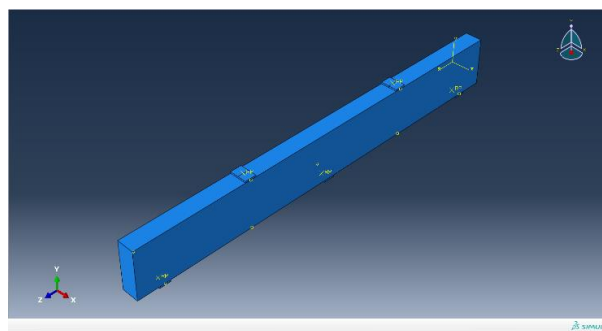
Assembly of continuous concrete deep beam, CFRP reinforcement and bearing plates
